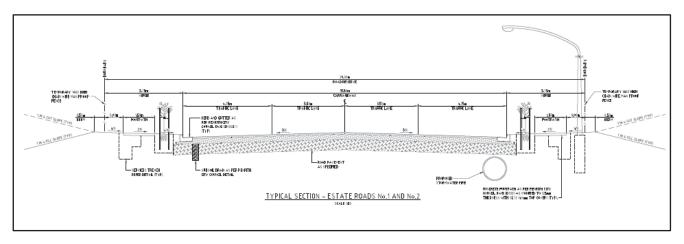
Typical Estate Road Section for Roads No. 1 and No.2
